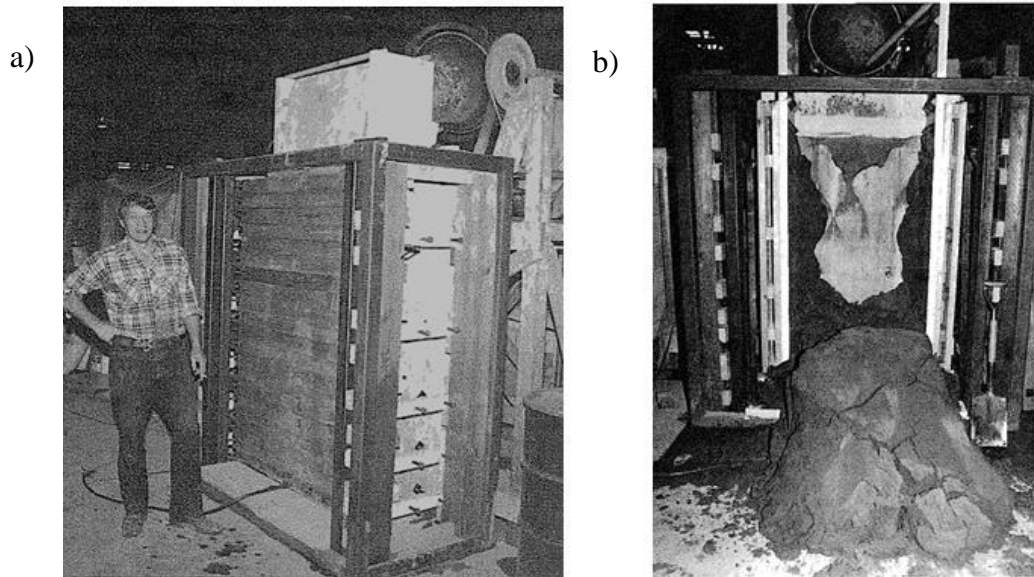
General views of a) model fill cast in formwork, b) failure test with a surcharge (from Mitchell et al., 1982).
